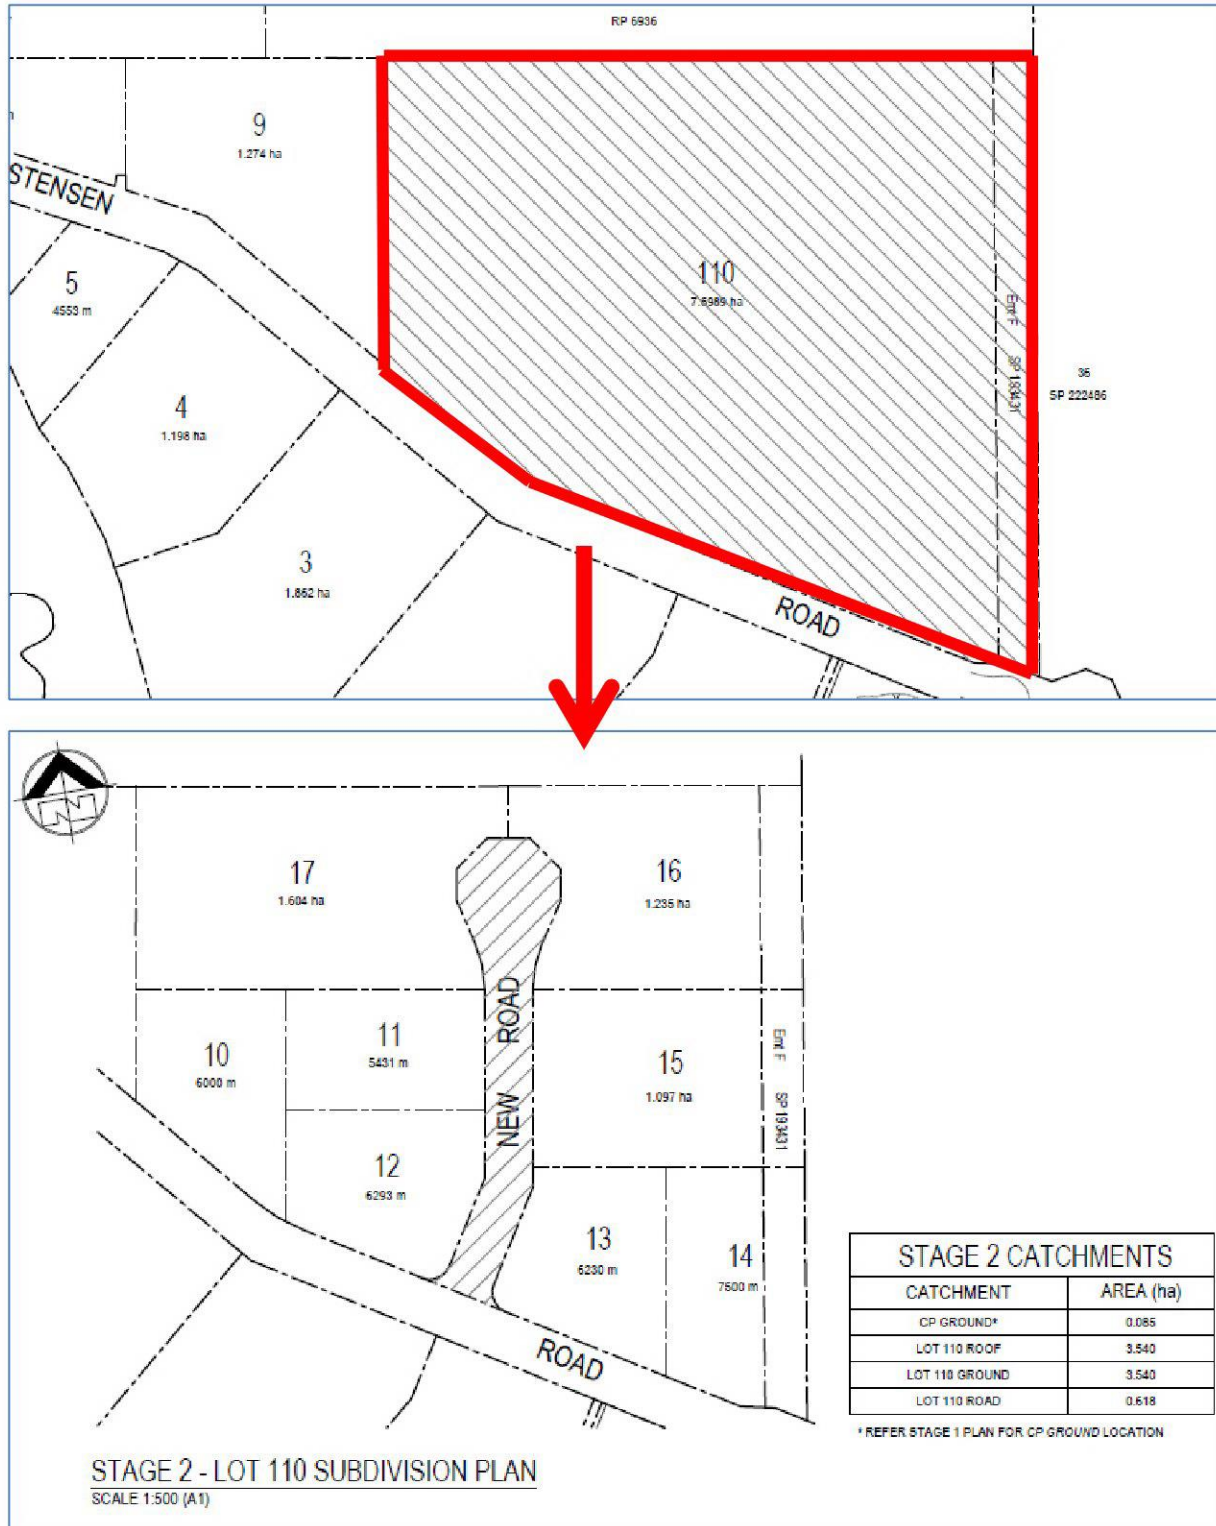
Stage 2 – Lot 110 Subdivision Plan
